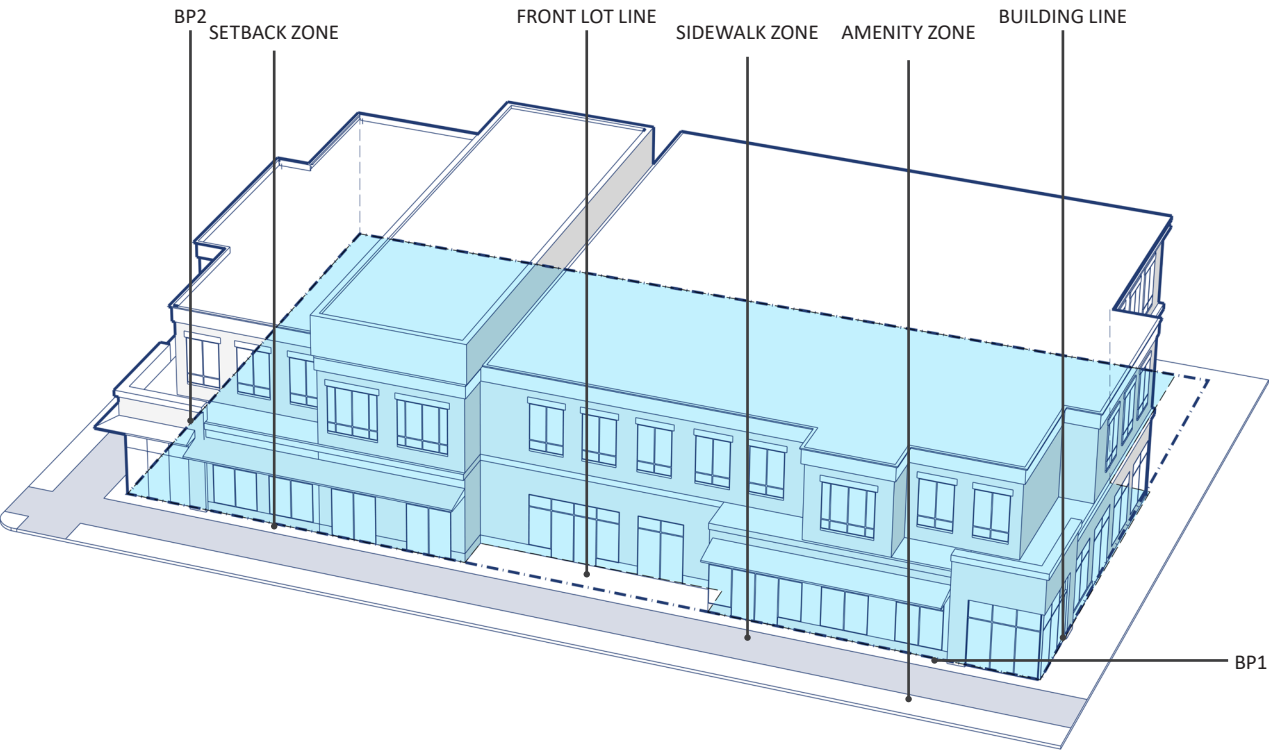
Building Placement, Facade Lot Line Coverage (Corner Building)
